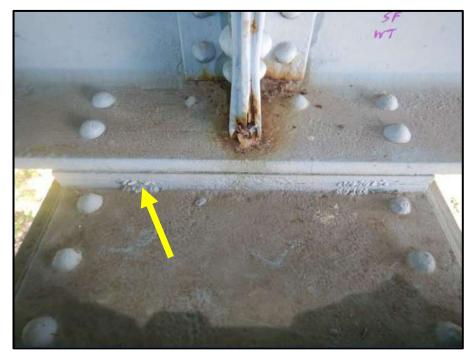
Tack welds connecting floorbeam bearing plate to top of upper chord.
